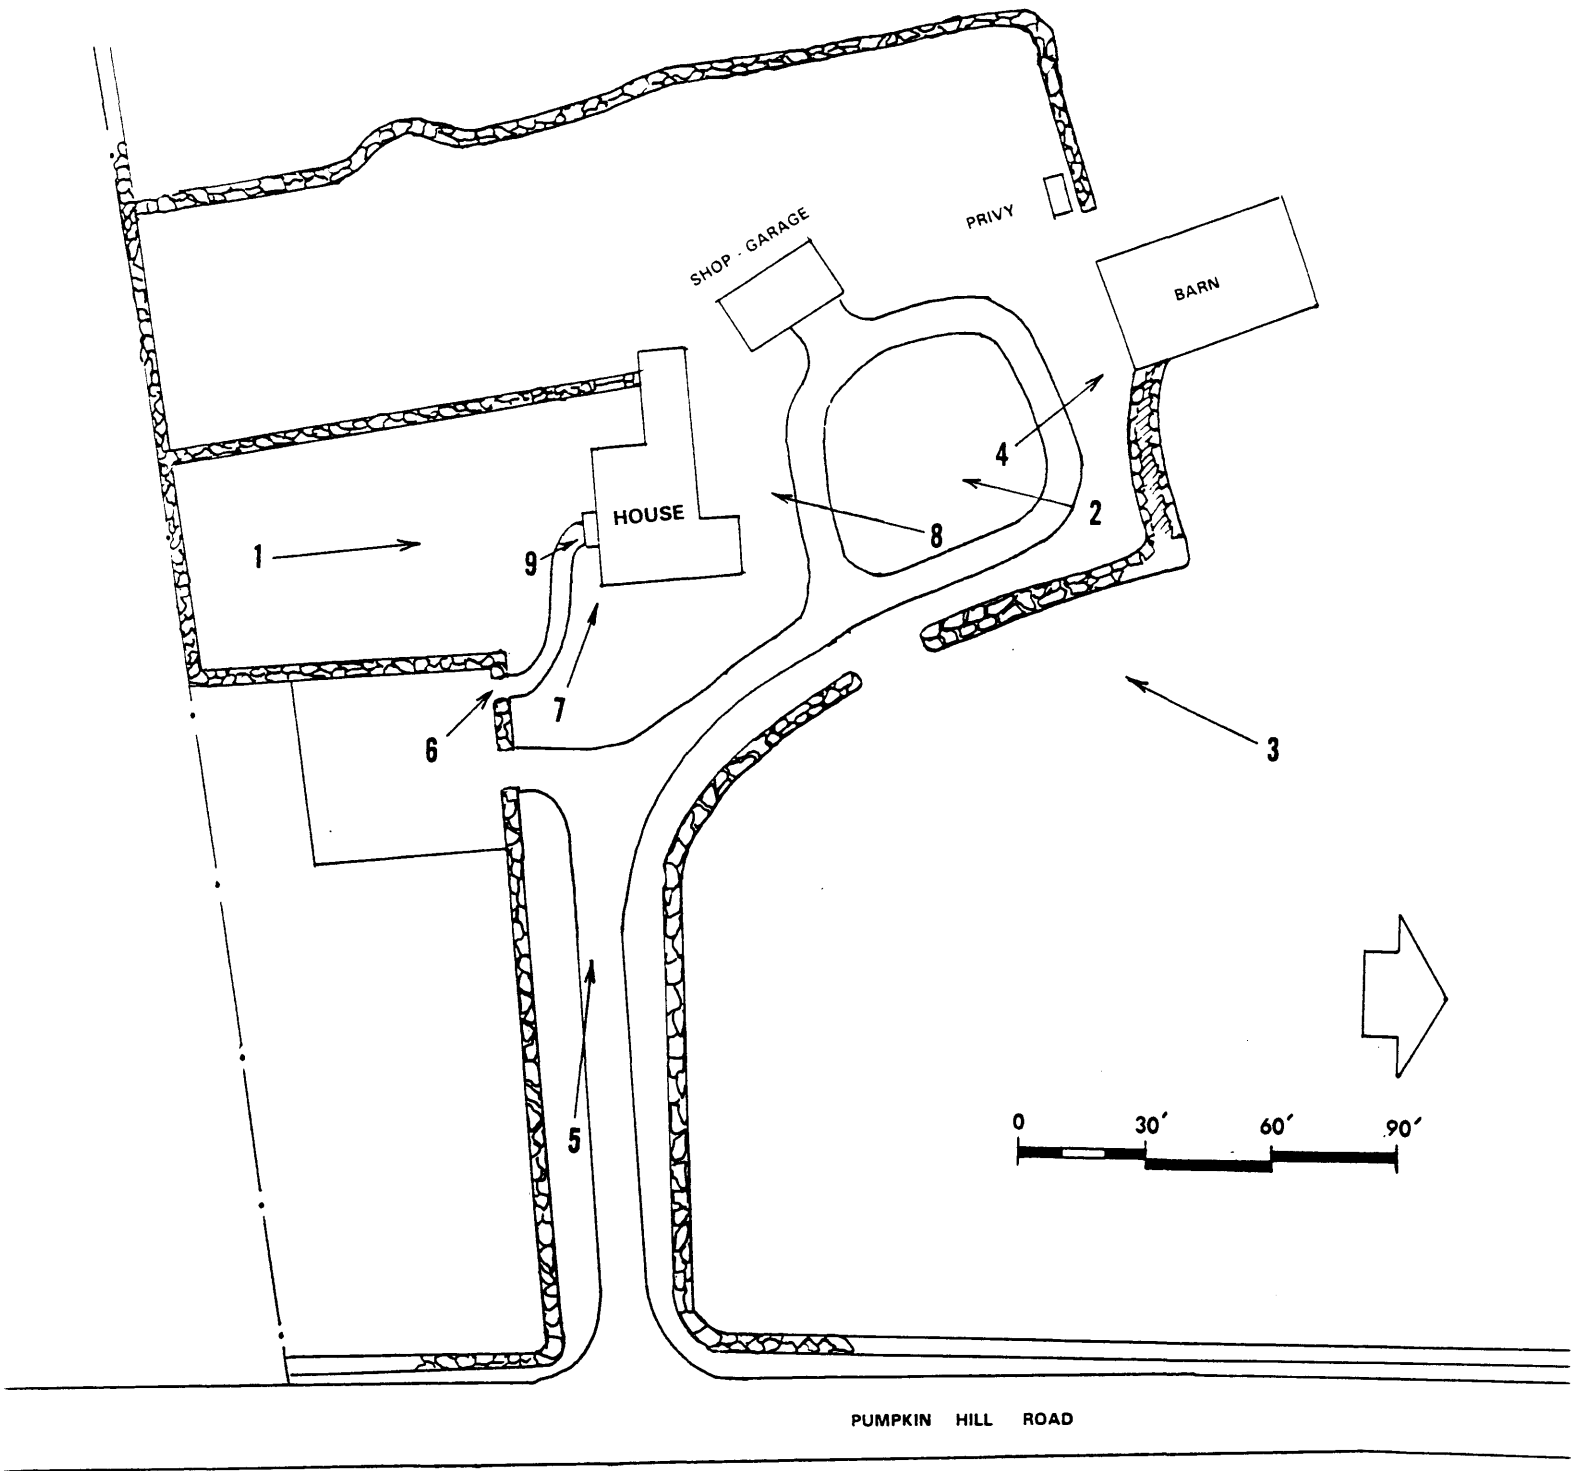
EXHIBIT A: PARTIAL SITE PLAN - SHUBEL SMITH HOUSE
